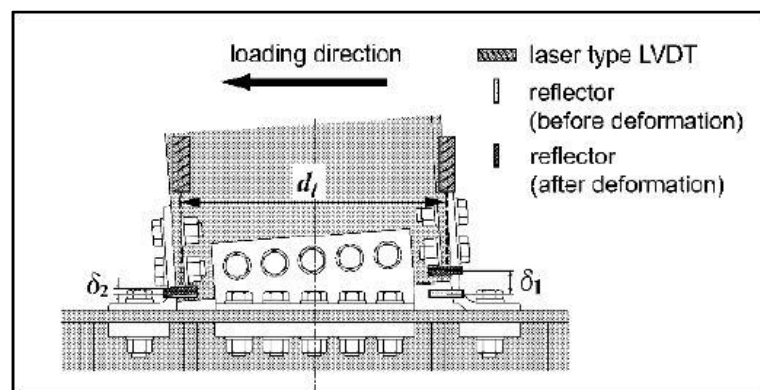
Deformed Shape of the Specimen, Komuro et al. (2003)
